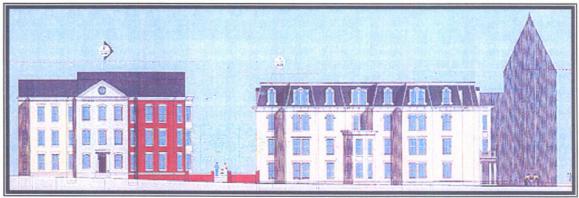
Proposed Montgomery Street elevation for Certificate of Appropriateness Review
